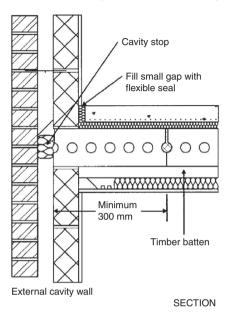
Junctions with an external cavity wall with masonry inner leaf
